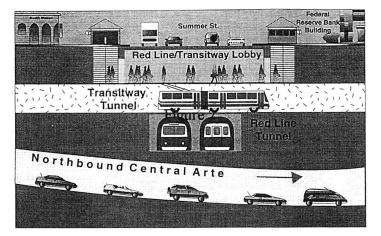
Artist rendition of CA/T Tunnel Crossing under MBTA Red Line Tunnel and Transitway Tunnel.
